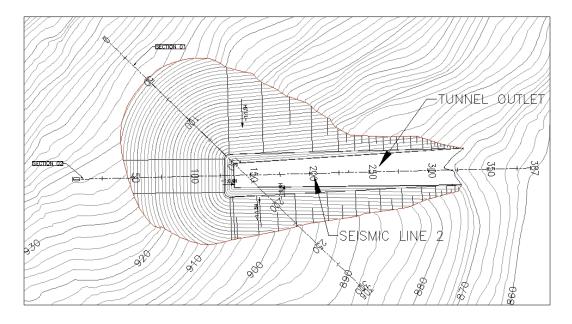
Plan view of tunnel outlet portal showing Sections 01 and 02
